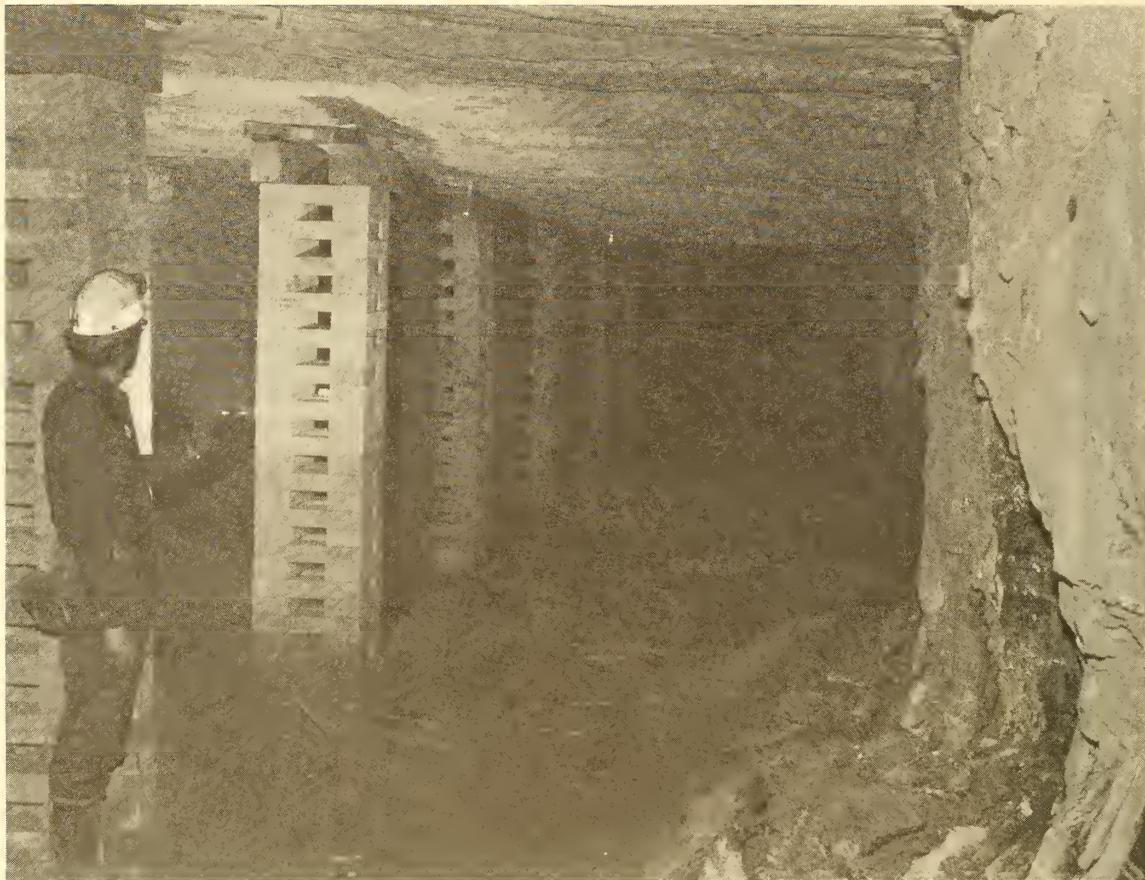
Tailgate supported with concrete cribbing ahead of longwall face. Alabama mine.
